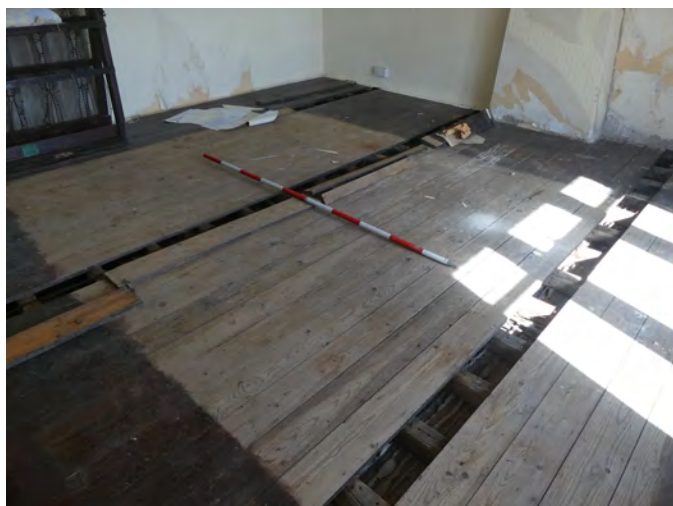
(left): Floor in F9 (farmhouse), viewed from the south
